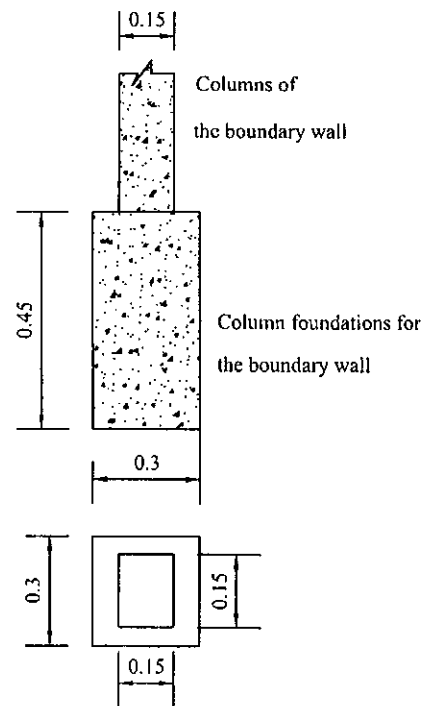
(c): Foundation Details for Columns of the Boundary Wall
